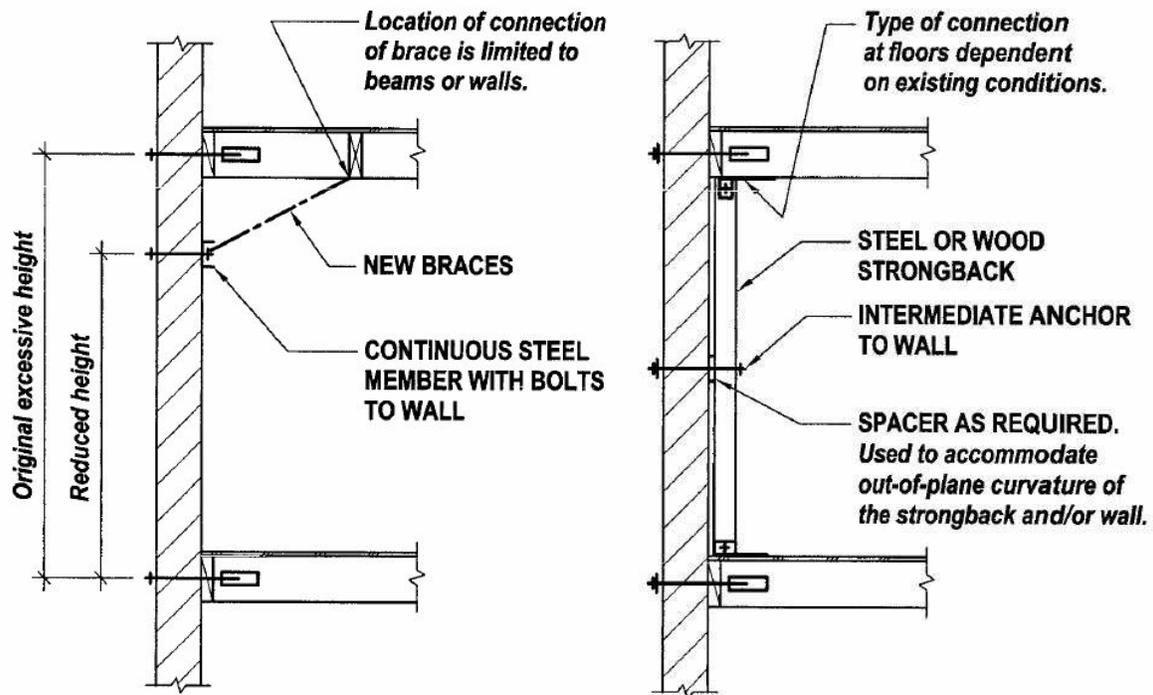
OoP Bracing, Intermediate Brace (left) and Strongback (right)
